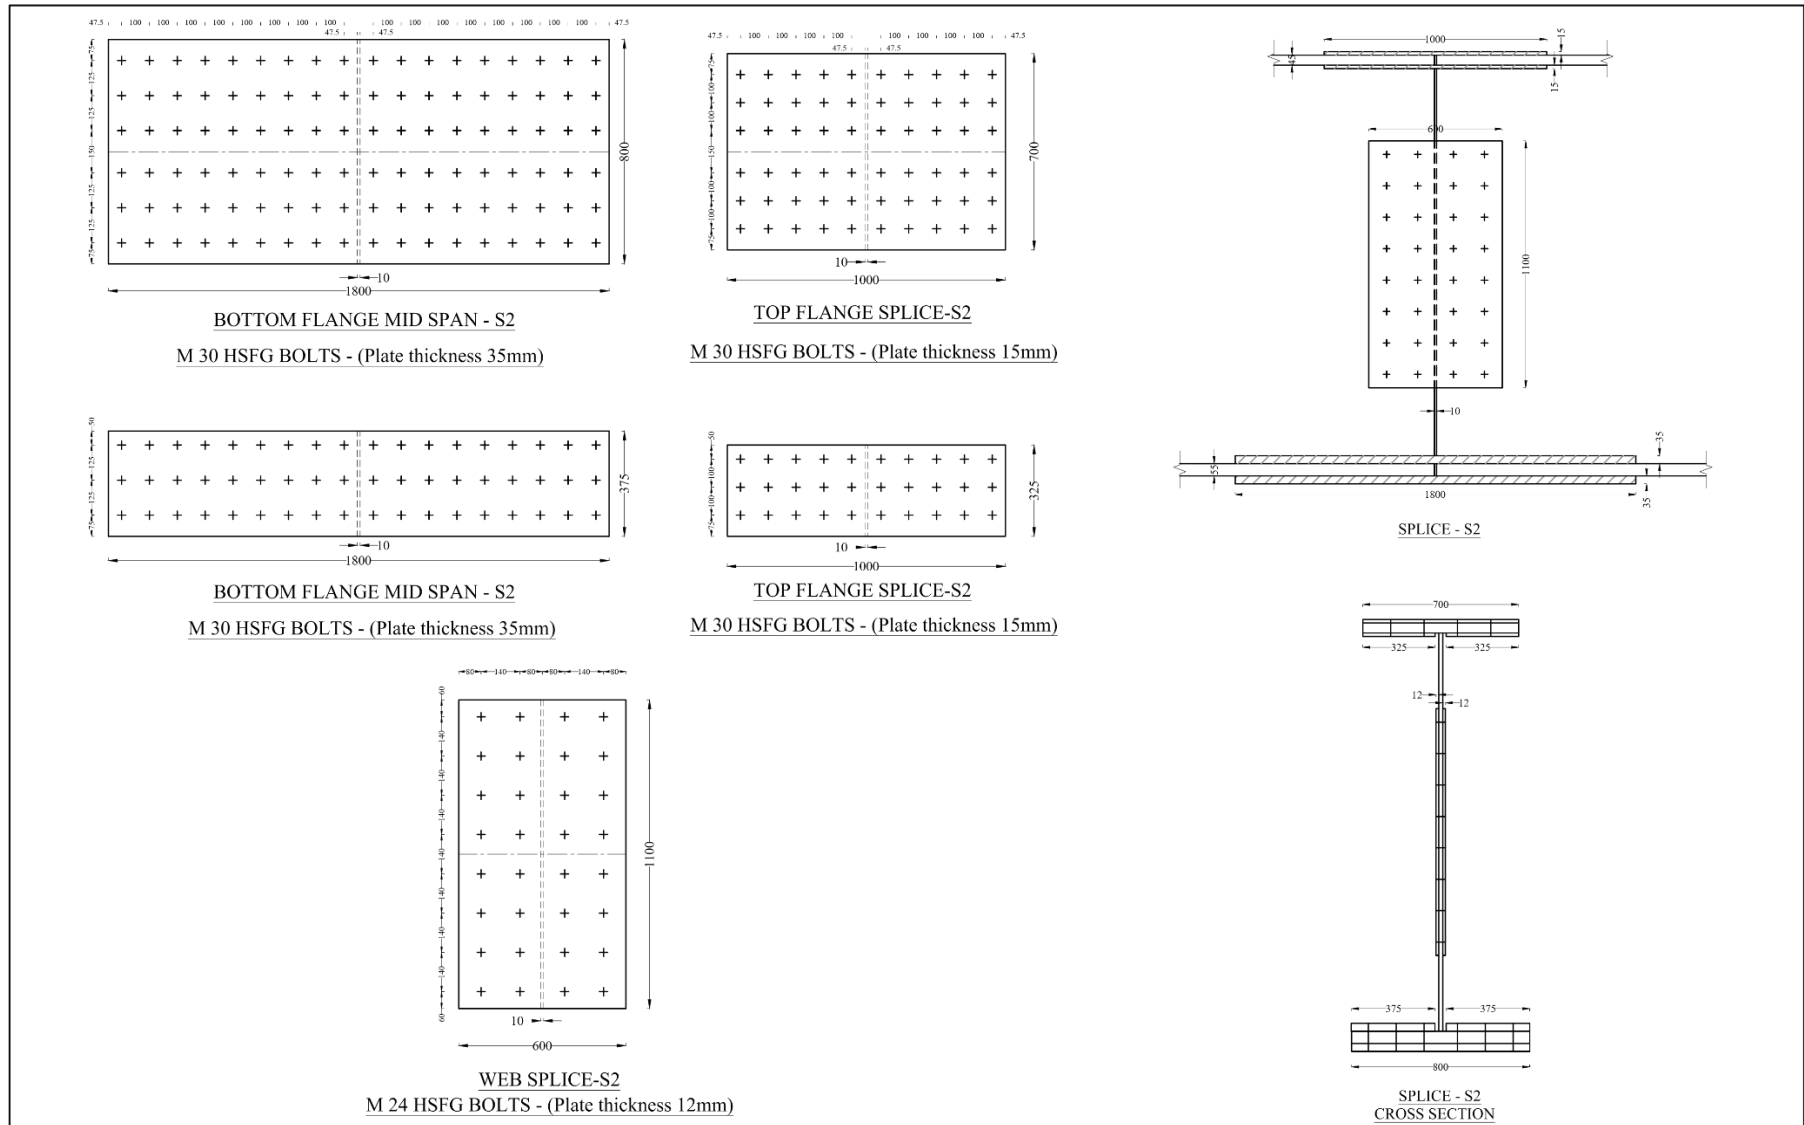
STEEL CONCRETE COMPOSITE LADDER DECK SPAN 40m
